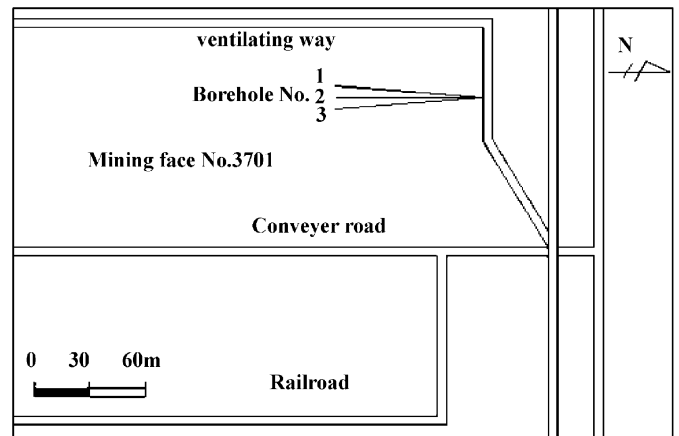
Plan view of mining face No. 3701 in Yangchun coal mine.
